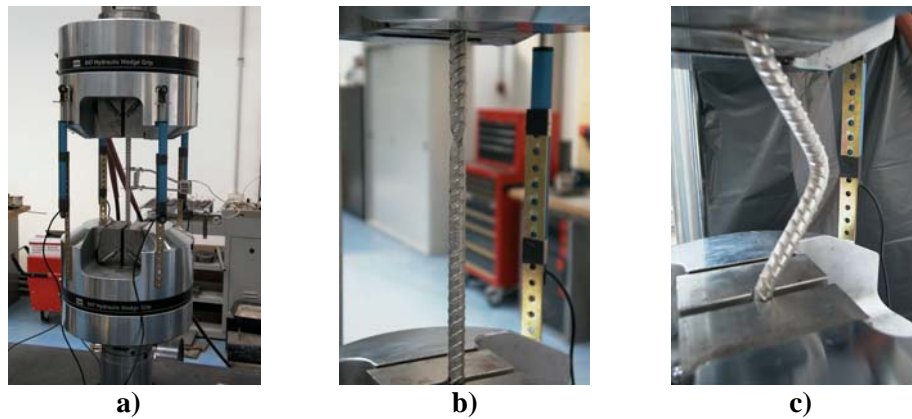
Testing machine and the specimen: a) Test machine MTS 810; b) specimen in tension; c) specimen in compression
